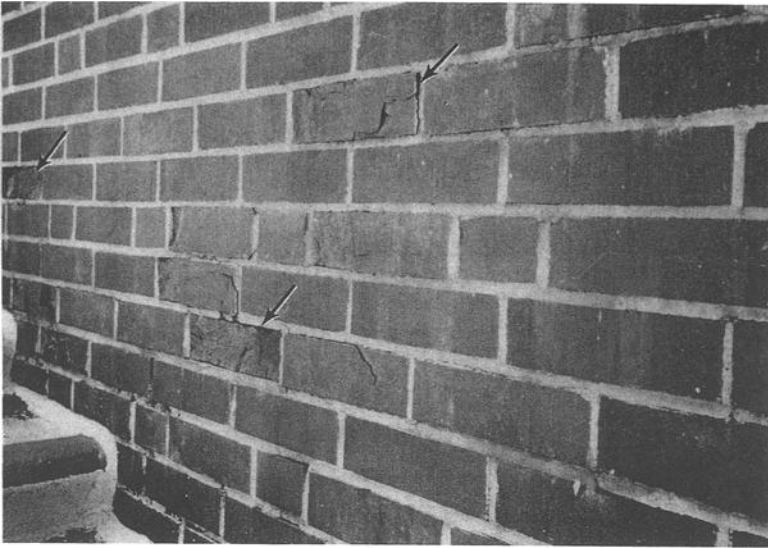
View of spalled brick due to cyclic freezing of moisture trapped by coating on brick
